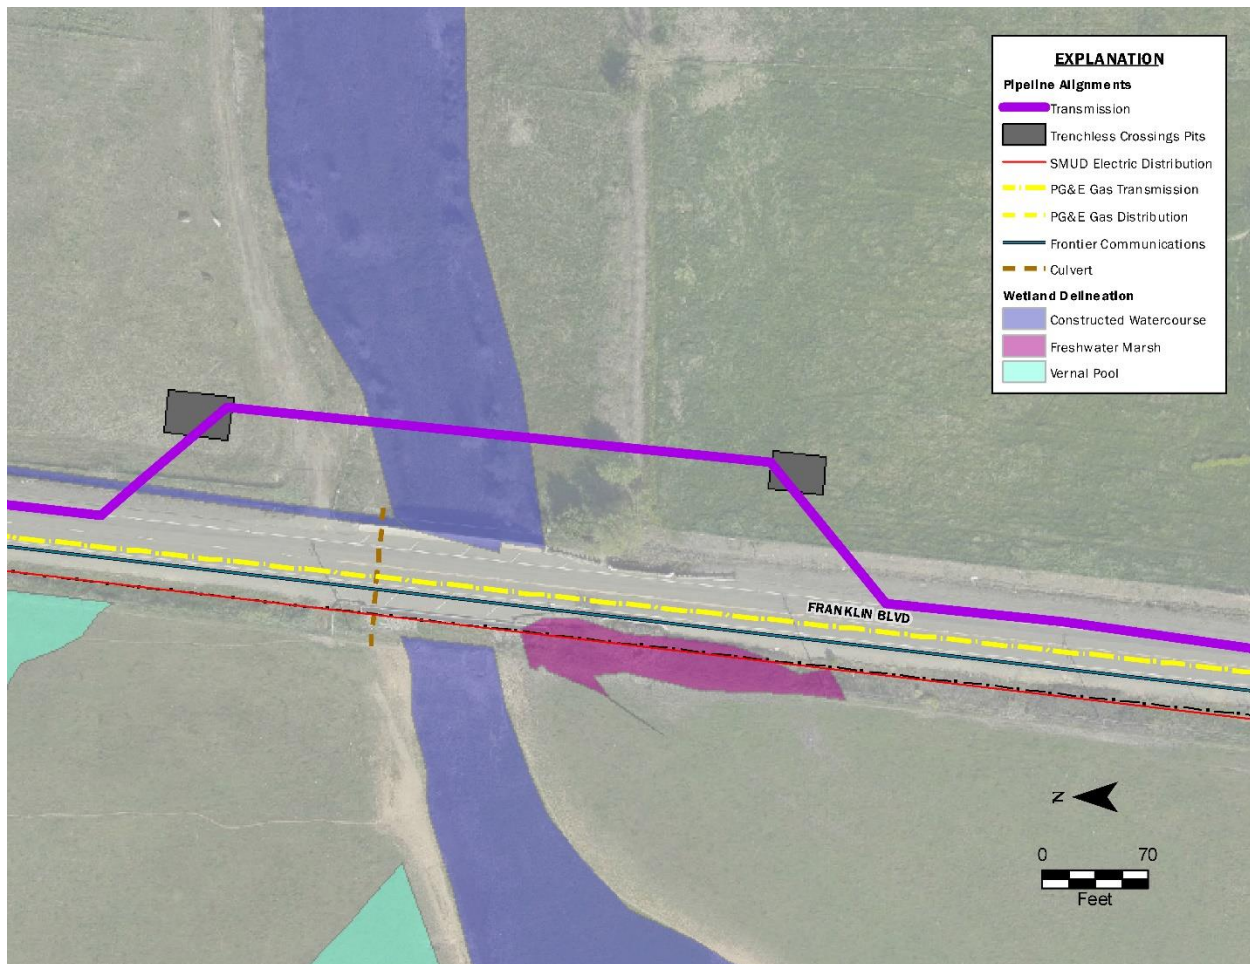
Proposed Trenchless Crossing of Franklin Creek at Franklin Boulevard
